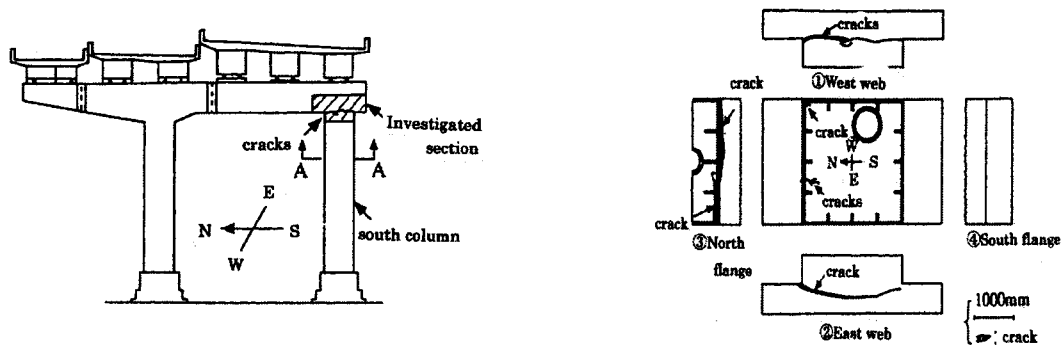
Cracks occurred in beam to column connections of steel rigid frame pier P75 in Harbor Highway.
